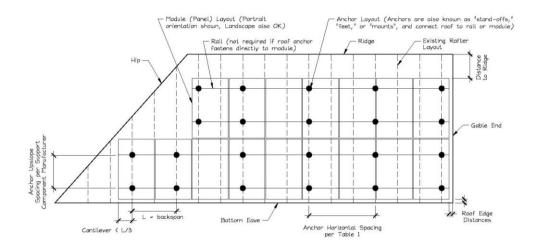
Sample Solar Panel Array and Anchor Layout Diagram (Roof Plan)
